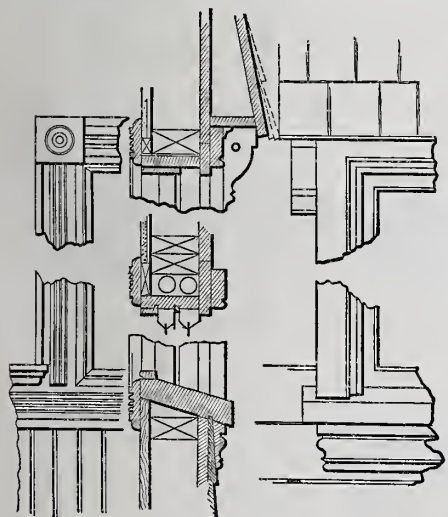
Exterior and Interior Details of Windows.—Scale, $\frac{3}{4}$ Inch to the Foot.
